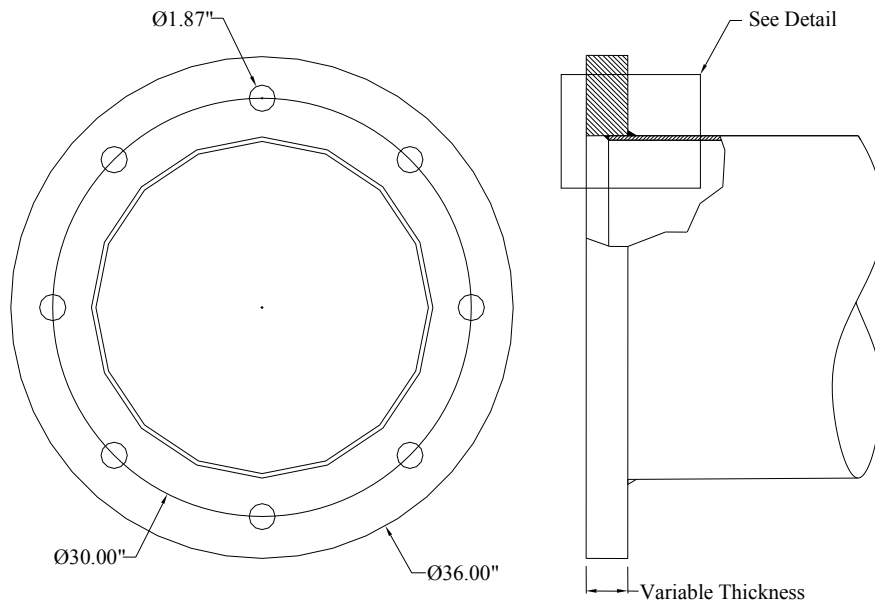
Fillet Welded Socket Connection Detail (Rios, 2007)
